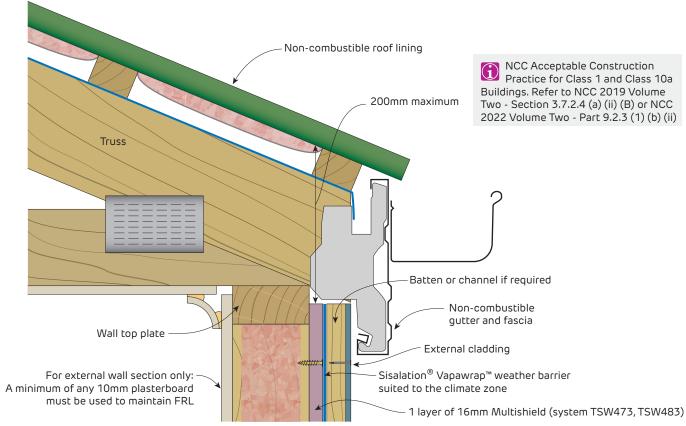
External Timber Wall to Non-combustible Gutter and Fascia
